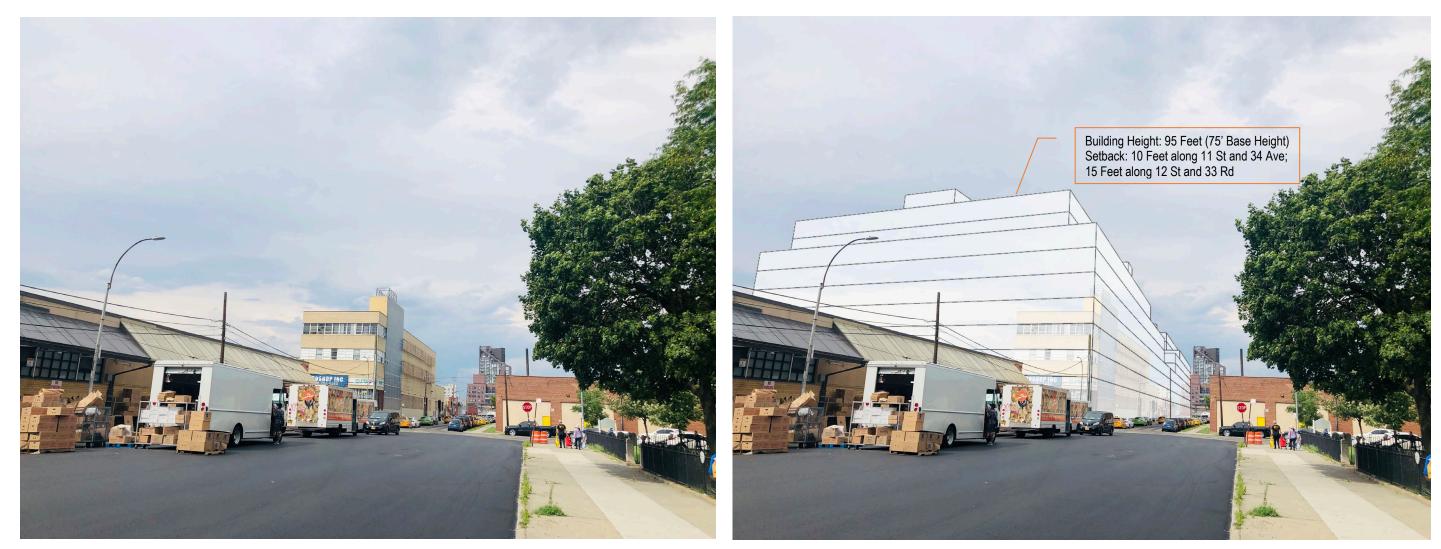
View #2 – From 12th Street Looking North Toward Project Site No Action and With Action Photomontage Comparison
